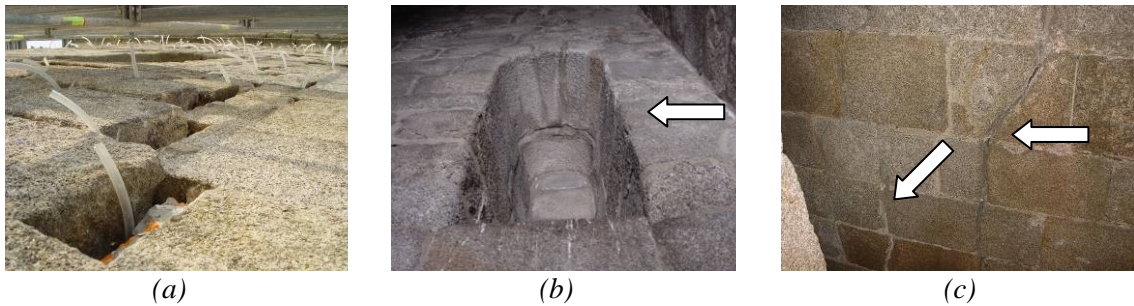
Details of the cracks in the towers: (a) cracks up to 0.20 m width in the South façade / South tower; (b) typical active cracks parallel to the walls at the openings; (c) vertical cracks at the base of the North tower.
